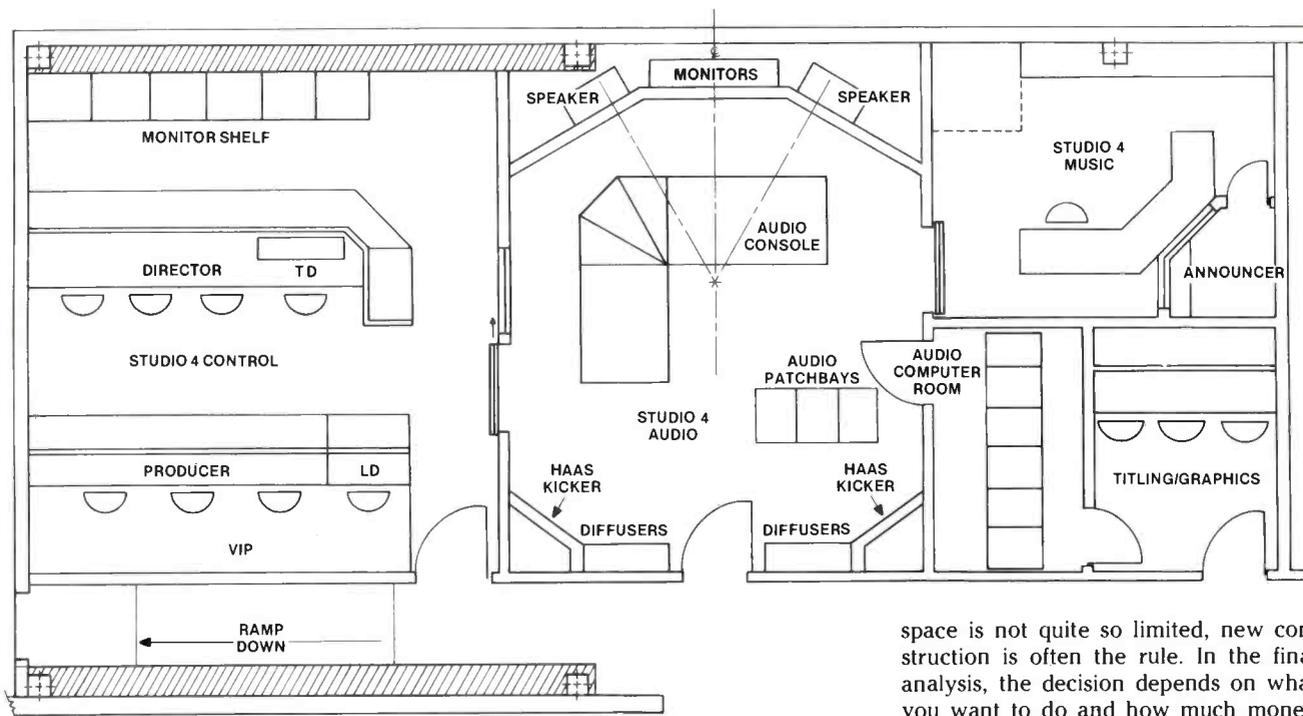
Basic floor plan for the control room area of Studio 4 at NBC's Burbank facility.
